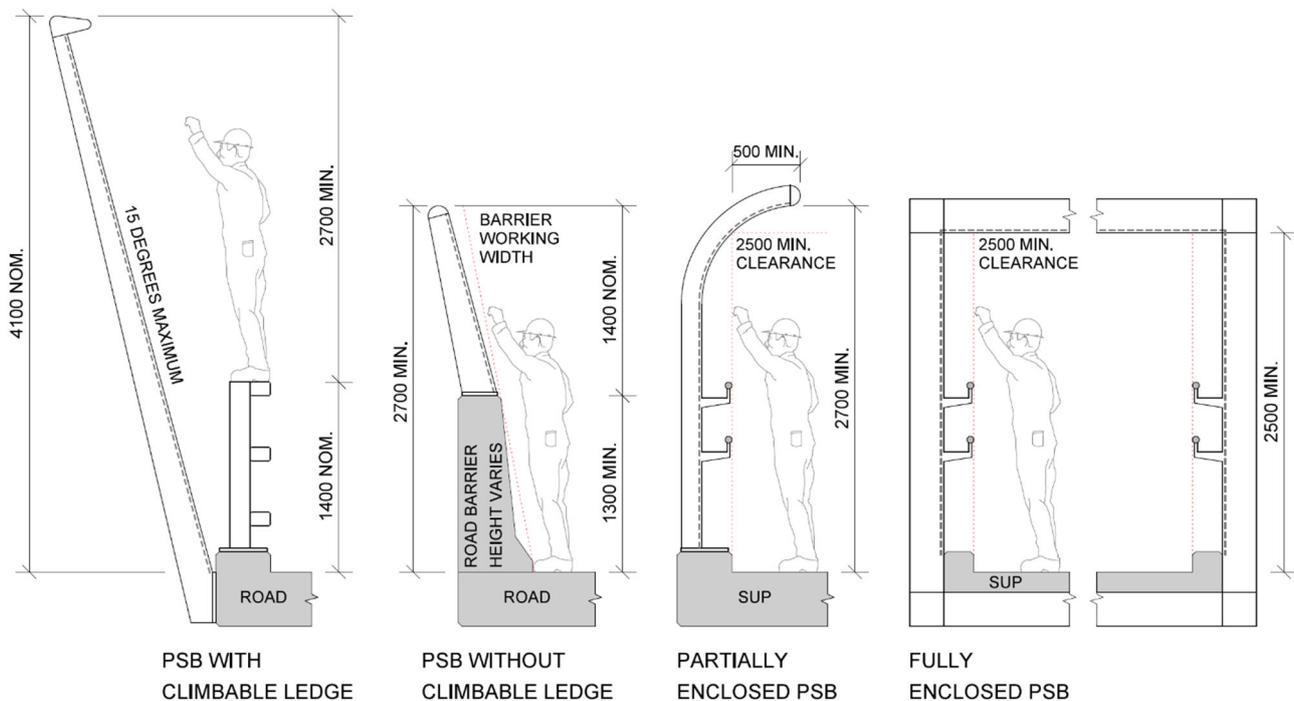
Examples of Typical Public Safety Barriers showing minimum height and orientation requirements
